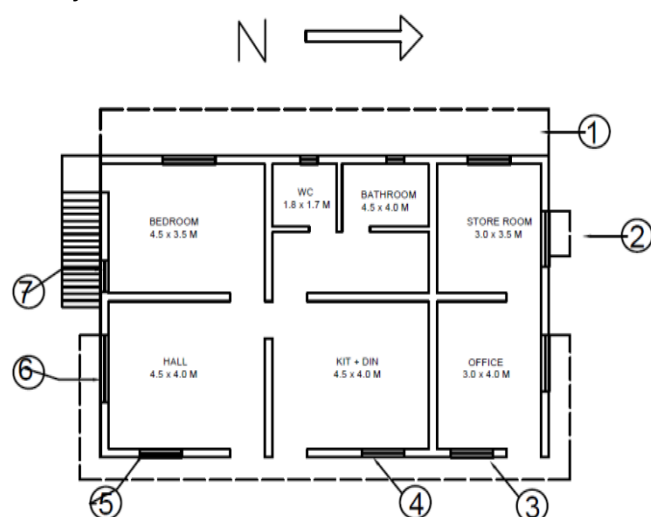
Plan for Retrofitted building (Ground Floor)
